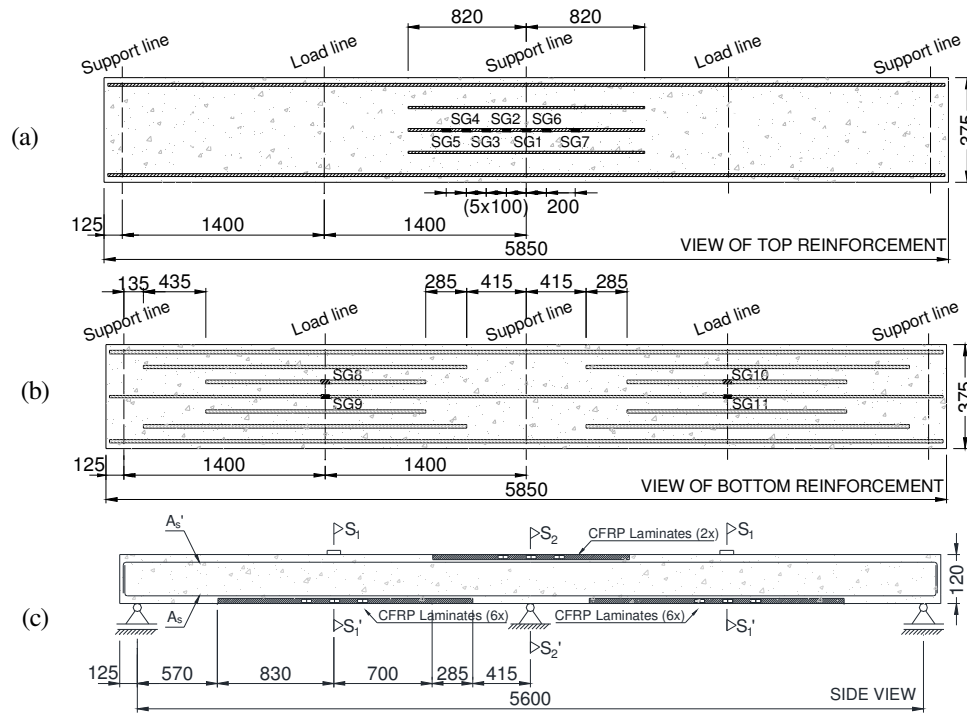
Arrangement of the (a-b) longitudinal steel reinforcement and (c) CFRP laminates of the SL45s50-HS slab strip.
